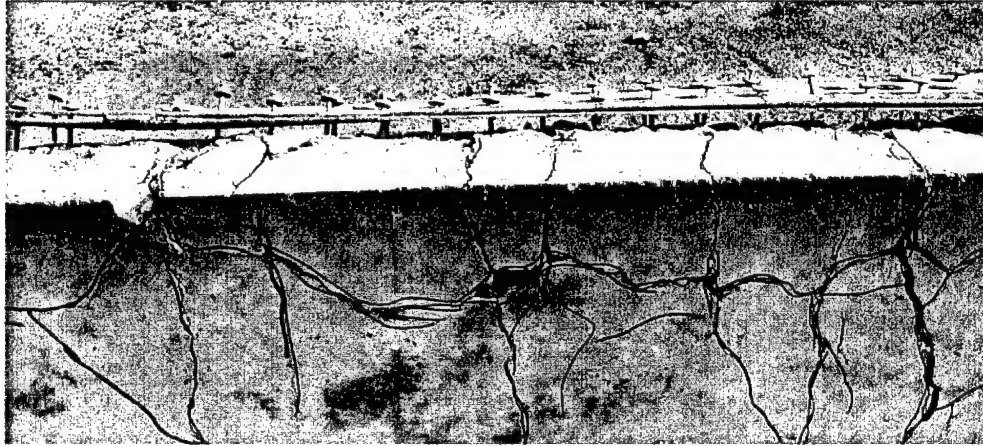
Large crack and origin of delamination for Beam A5_Test2 (Post-mortem of inverted beam)
